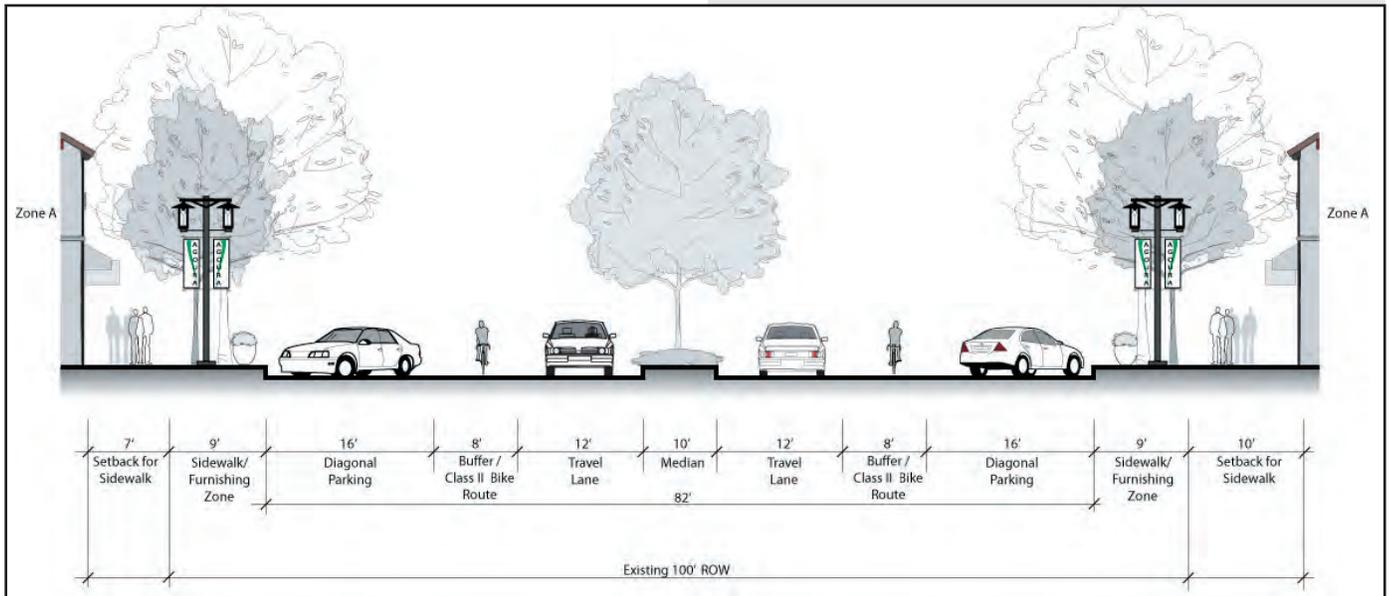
Future Agoura Road street section (between Kanan Road & Cornell Road)
